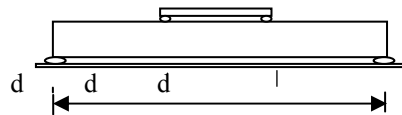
Principle of the third point loading method of flexural testing of concrete beams
